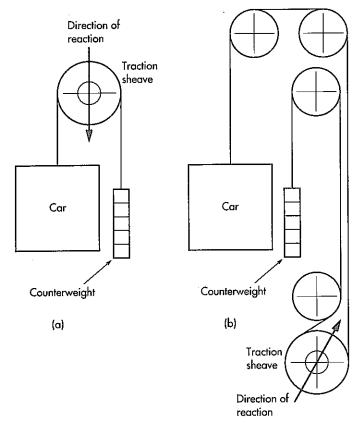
Sheave shaft load; (a) machine above with load acting directly downwards, (b) machine below with load acting upwards
